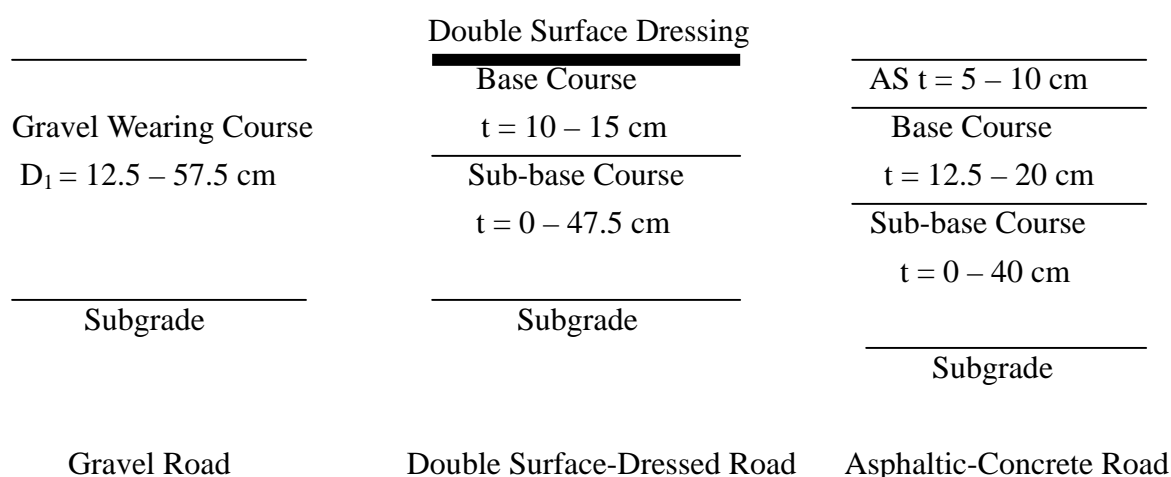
Typical Pavement Structure for Gravel & Paved Roads
